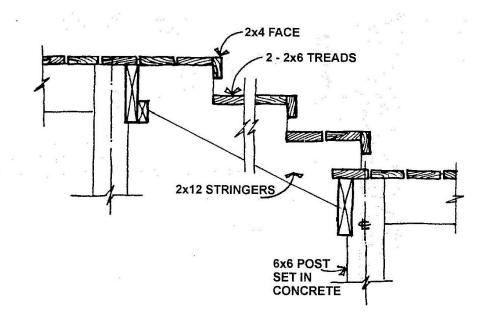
Example: Exterior Stairs from Deck to Ground
